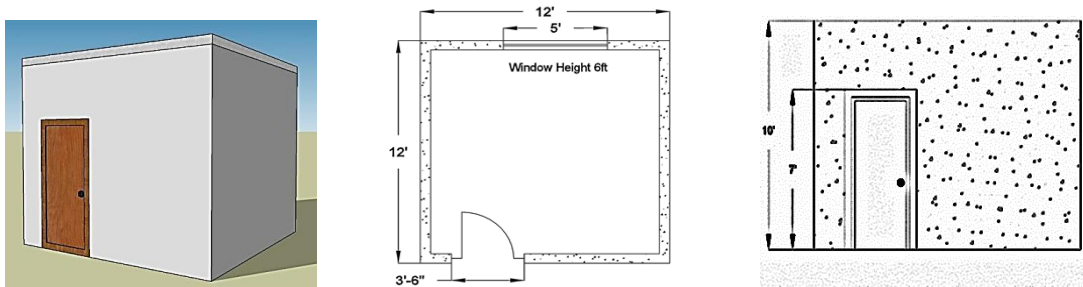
Hypothetical room model (a) elevation (b) plan (c) front view
